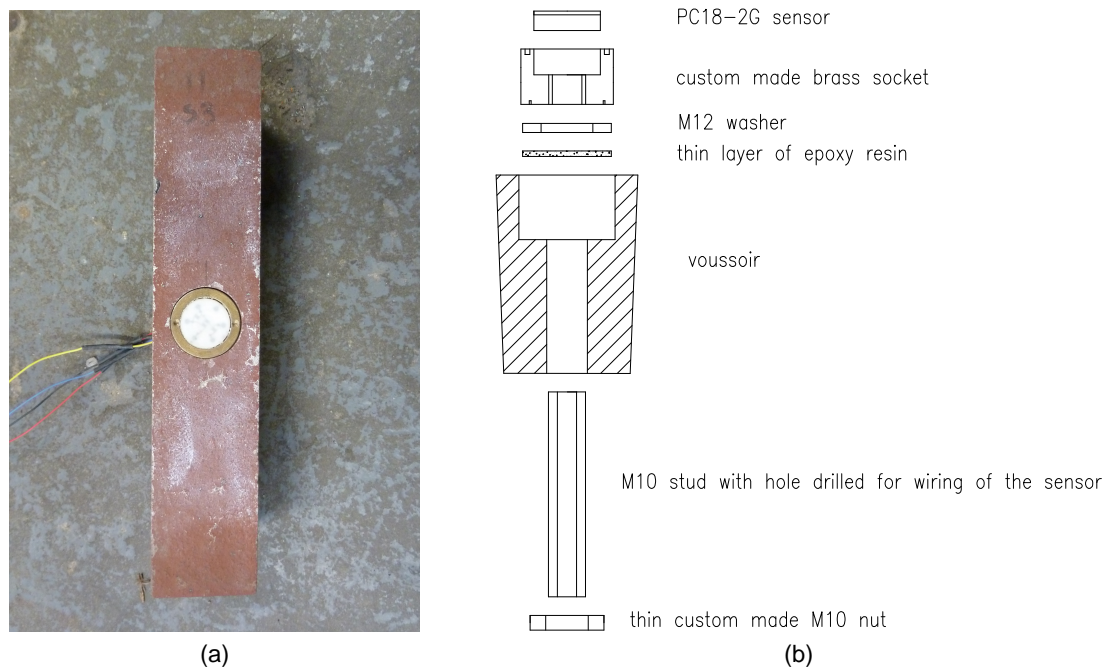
Fixing of the soil pressure sensors: (a) top view; (b) exploded view of the cross section
